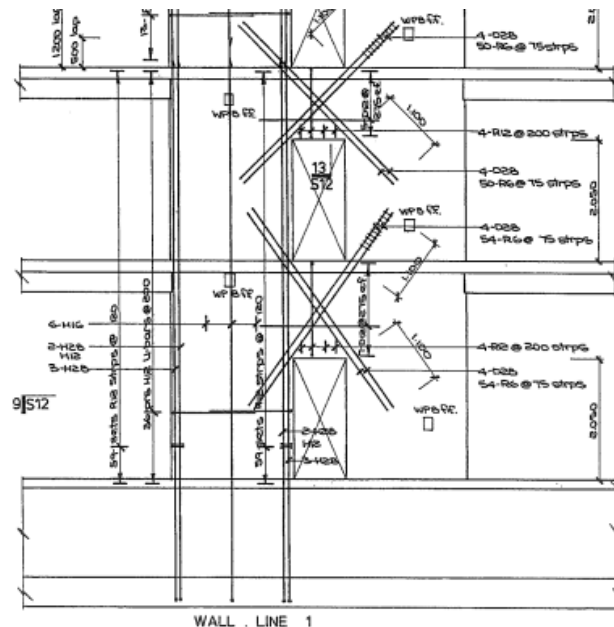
South shear wall typical coupling beam reinforcement arrangement (Design Engineer 1986a)
